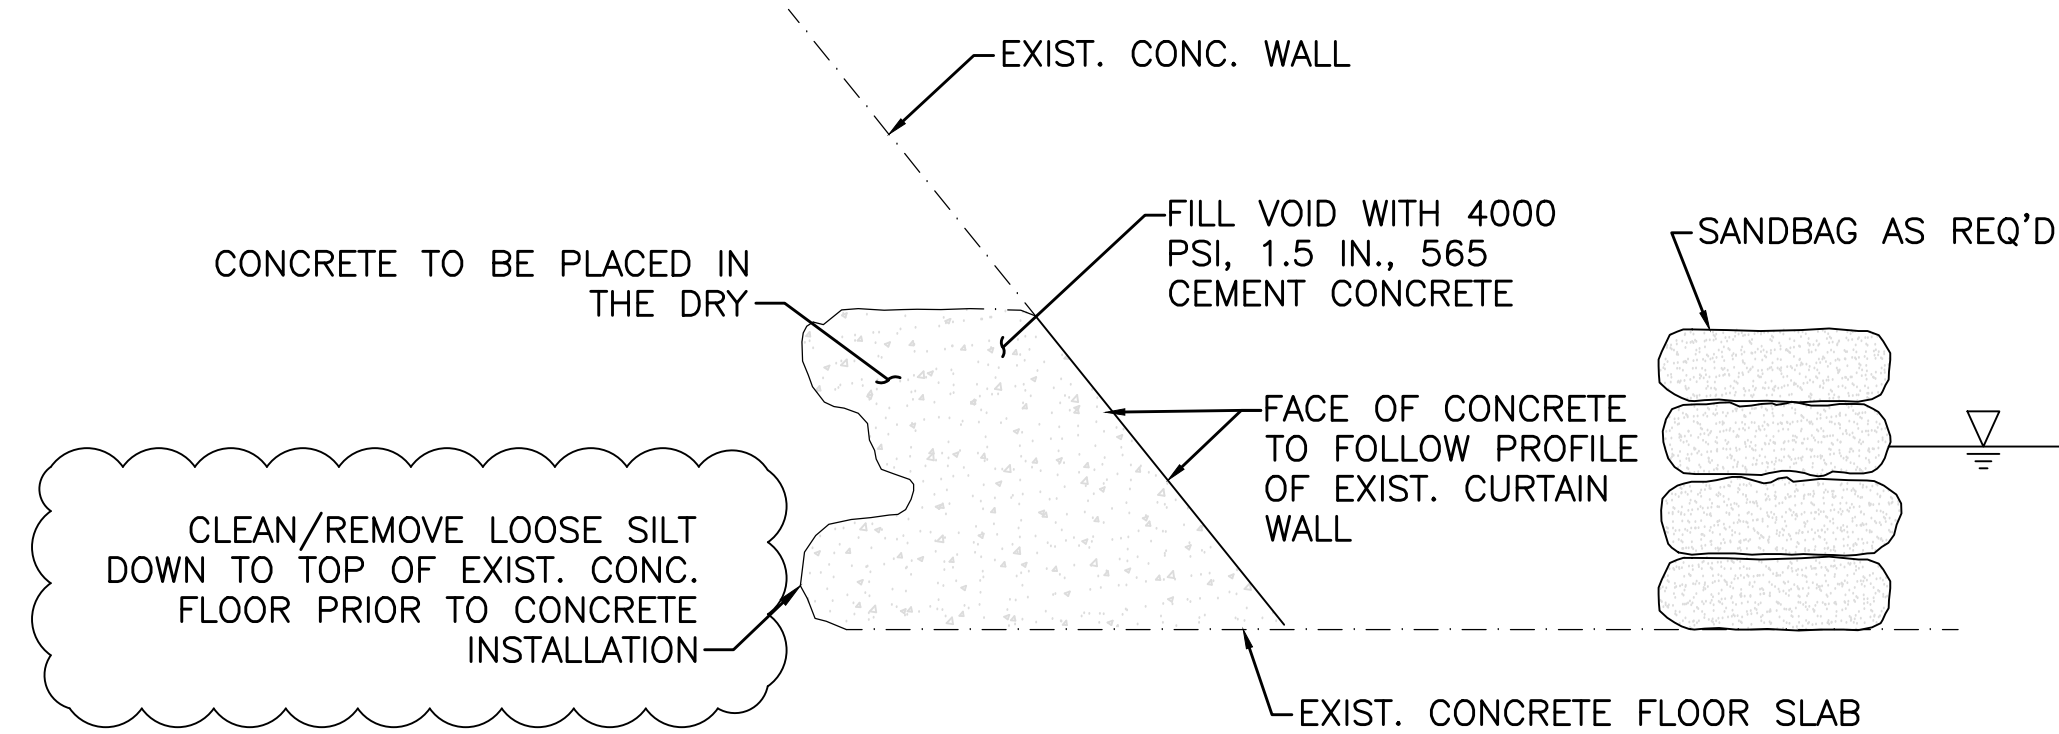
SHALLOW DEPTH SUBSTRUCTURE REPAIR
